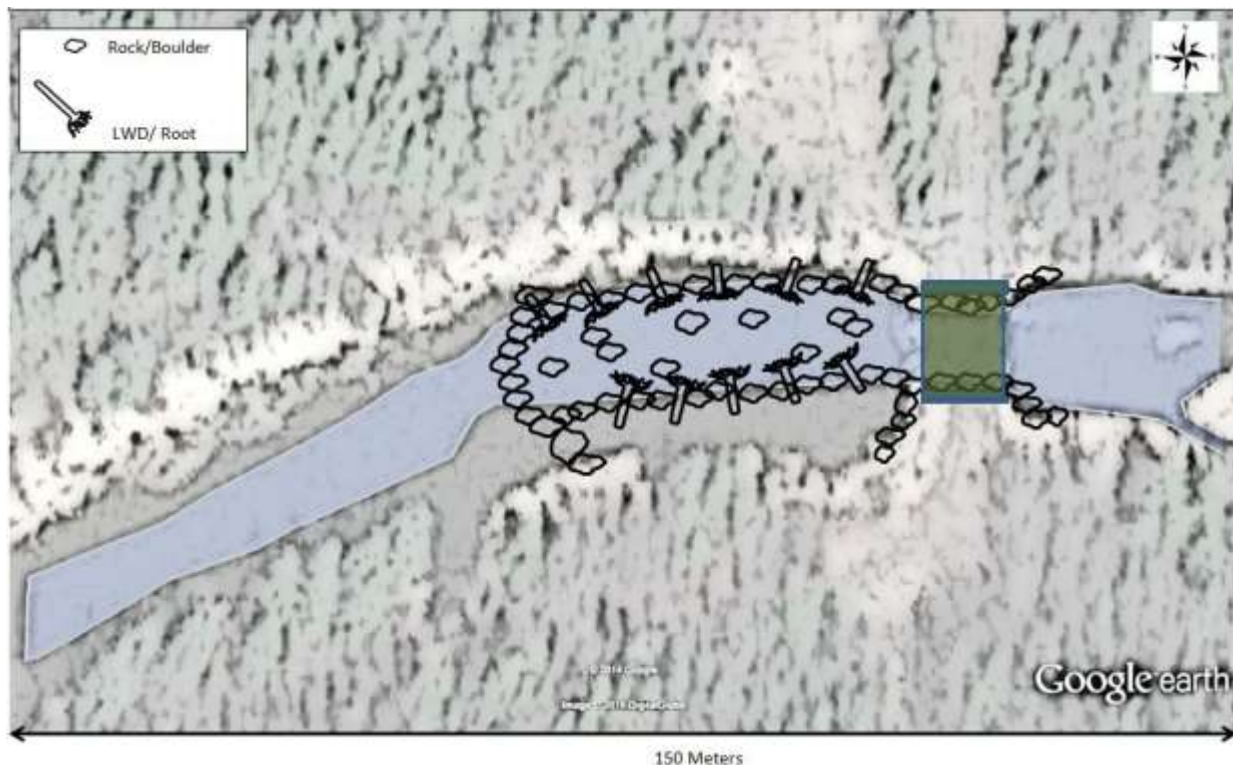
Schematic diagram of the L&M site illustrating proposed culvert replacement with a beam bridge installation, LWD and boulder locations and bank armouring.
